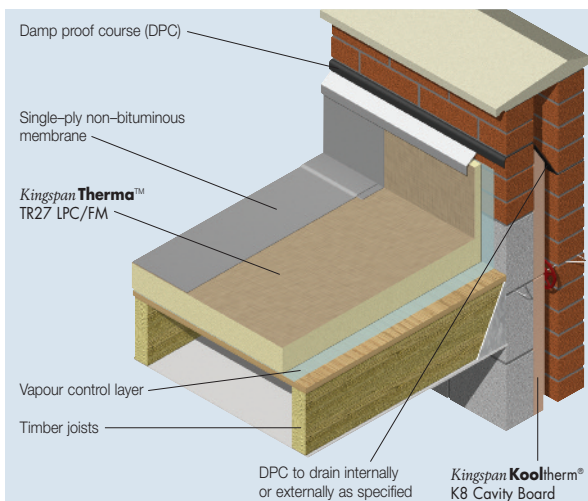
Insulation Installed Above a Timber Deck – Single-ply Membrane
